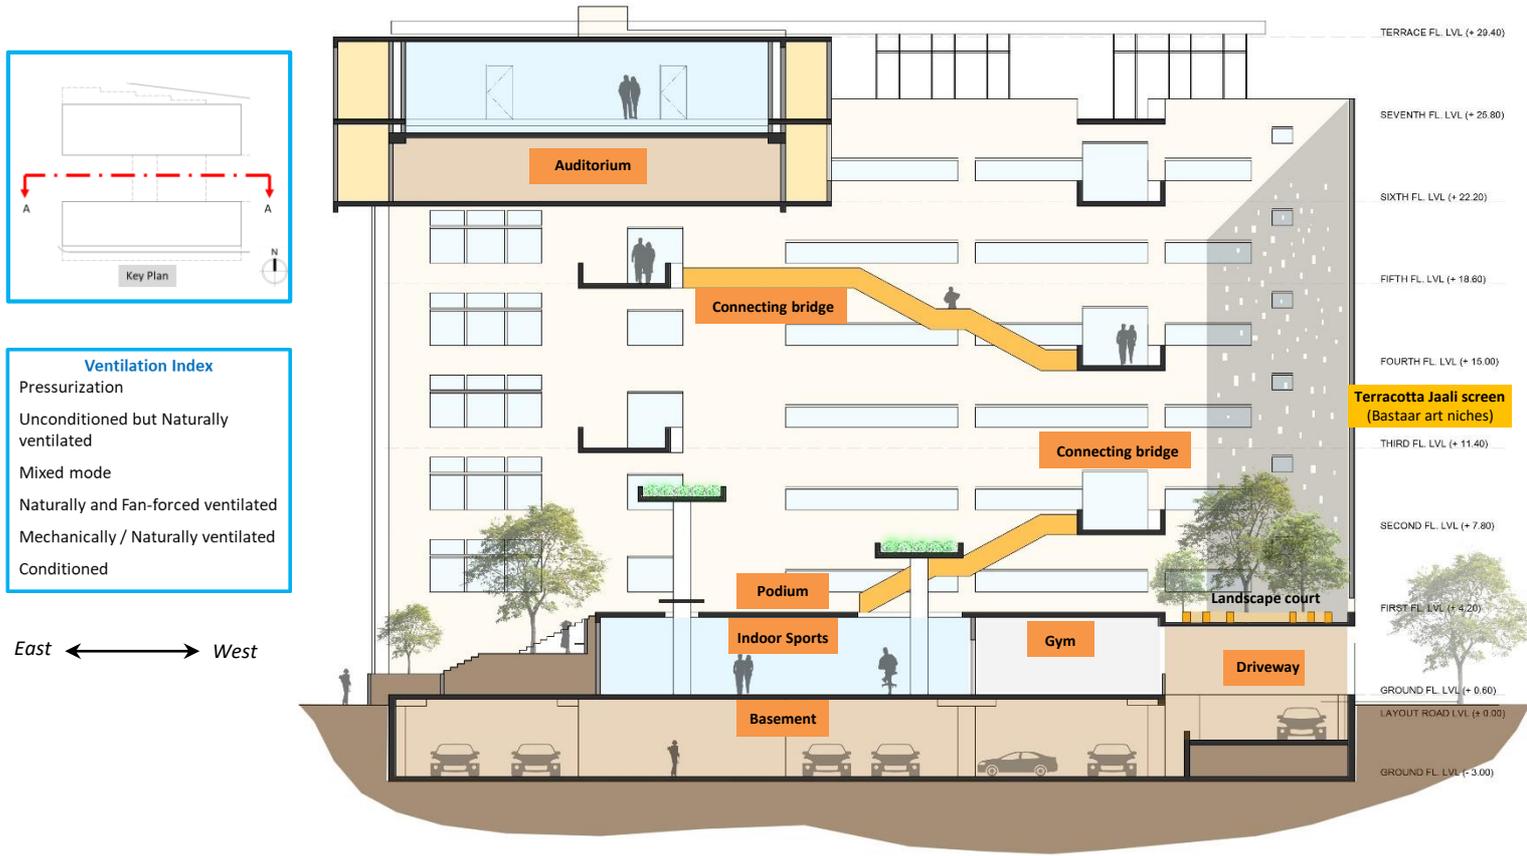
Sectional Details (for other sectional details refer Annexure sr. no. 6c)
